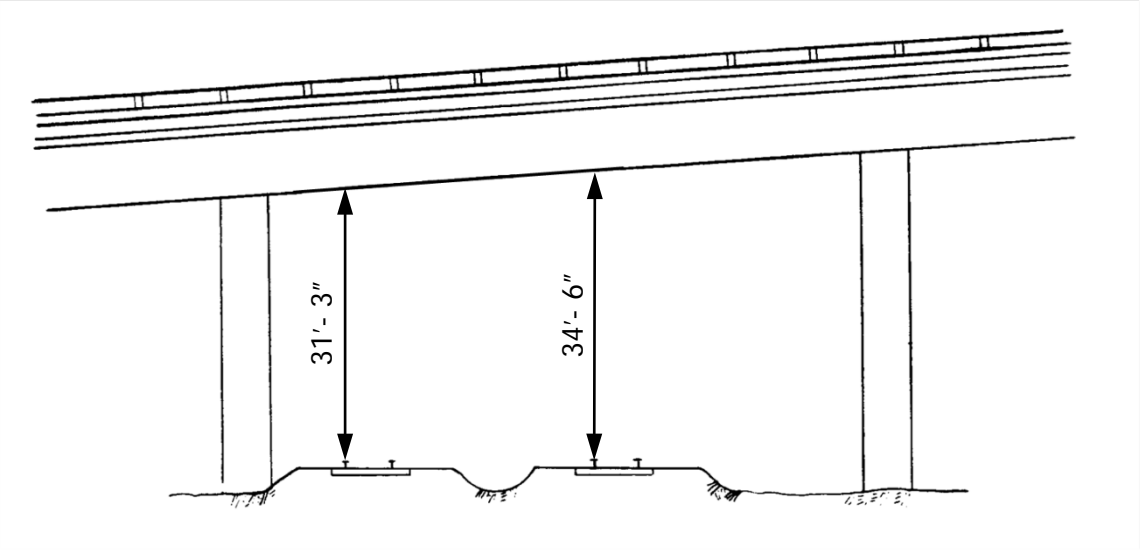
Bridge elevation view with an electrified passenger rail track and a non-electrified passenger rail track below the bridge.
